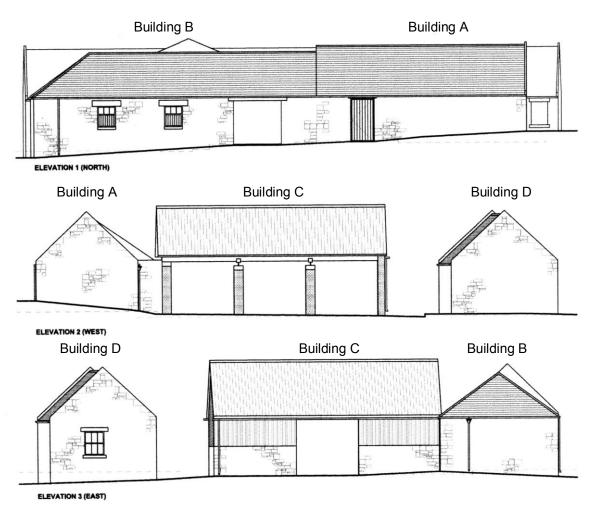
Elevations 1 to 3 of buildings A, B, C and D.
